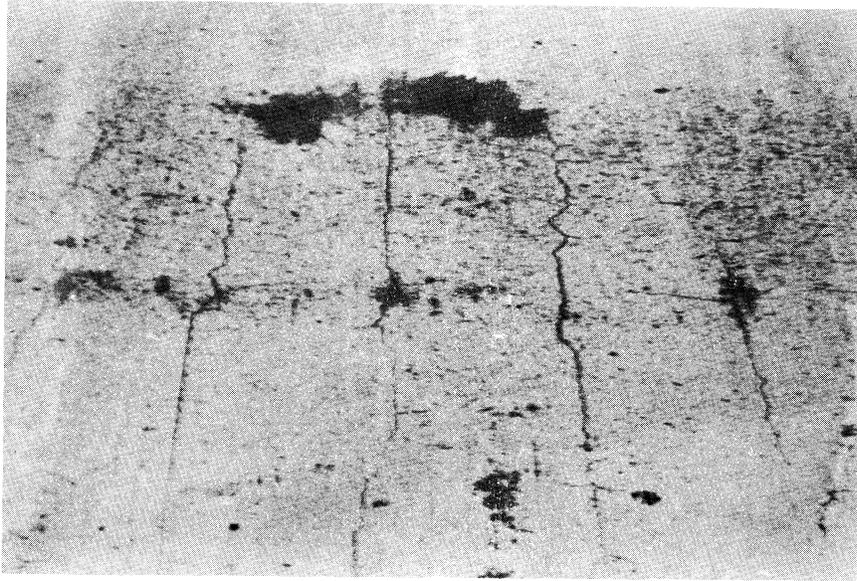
Recent cracking above transverse reinforcing steel in span 5. Hairline longitudinal cracking can be detected also.
